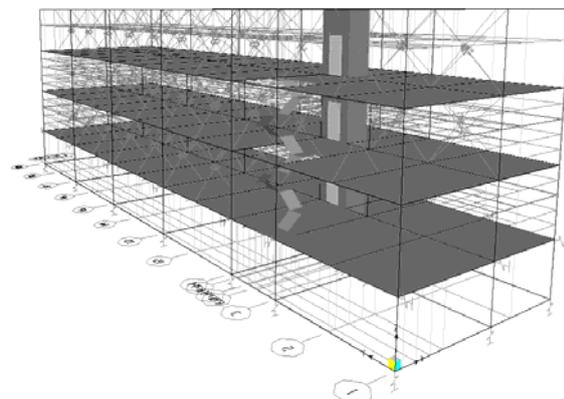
Three dimensional FEM showing shear core, soil springs, partition walls and stairs. Cladding has been removed from the view to show the inner details.
